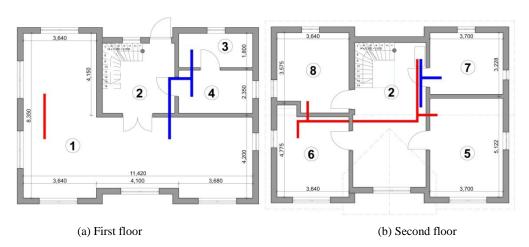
Sketches of the first and second floors: kitchen coupled to the living room (zone 1), corridor with an open staircase towards the second floor (zone 2), technical room (zone 3), bathrooms (zones 4 and 7) and bedrooms (zones 5, 6, 8); the layout of the ventilation network is shown in colour (red for the heated fresh air and blue for the exhaust air).
